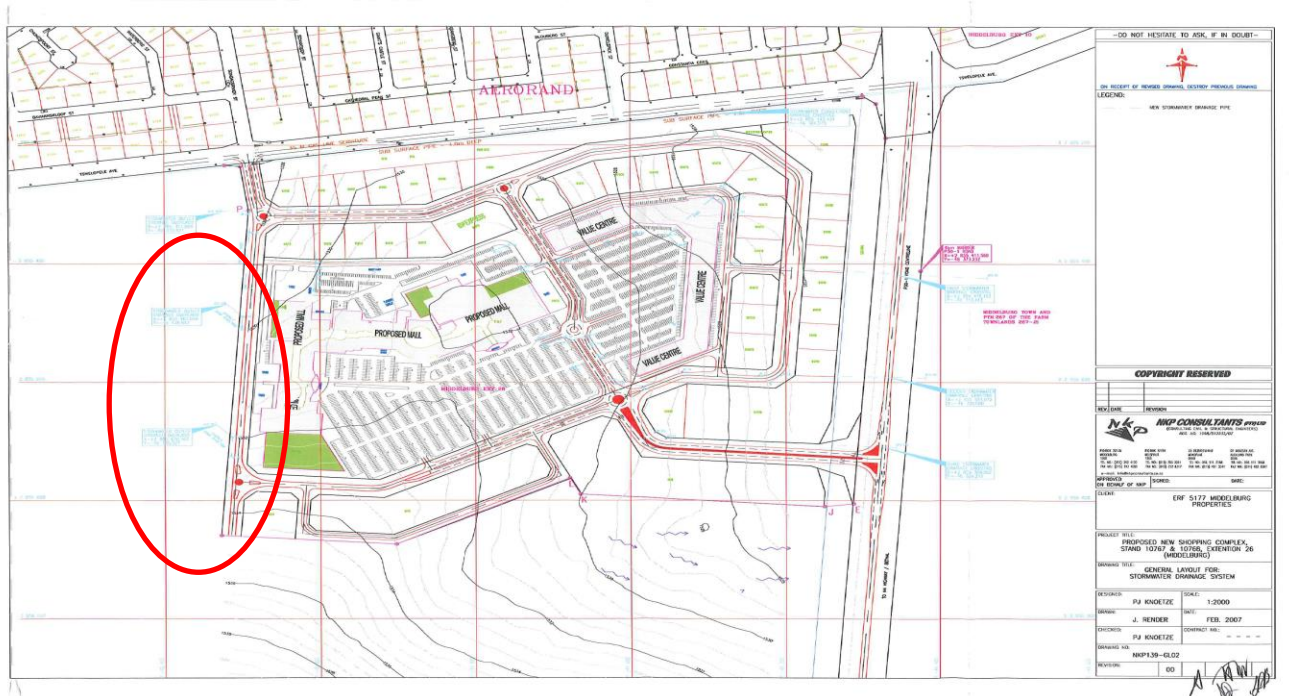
Layout plan of the mall showing the position of the stormwater outlets, and thus the position of the depression wetlands that have formed.
